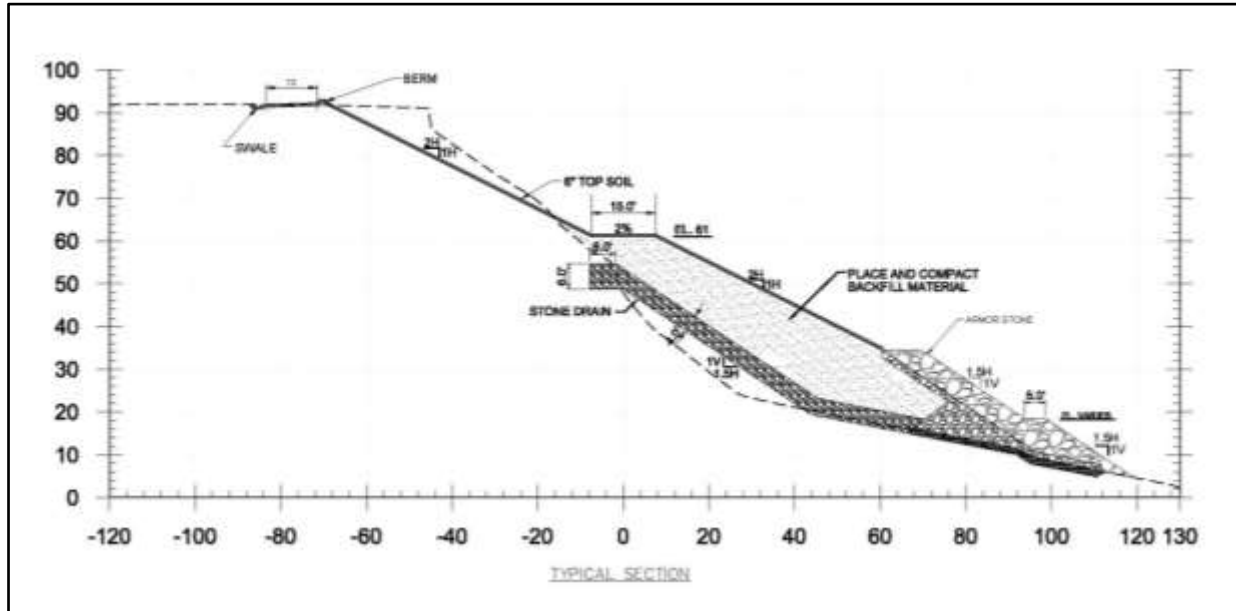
Alternative 4 Typical Section – Revetment with Weighted Toe
